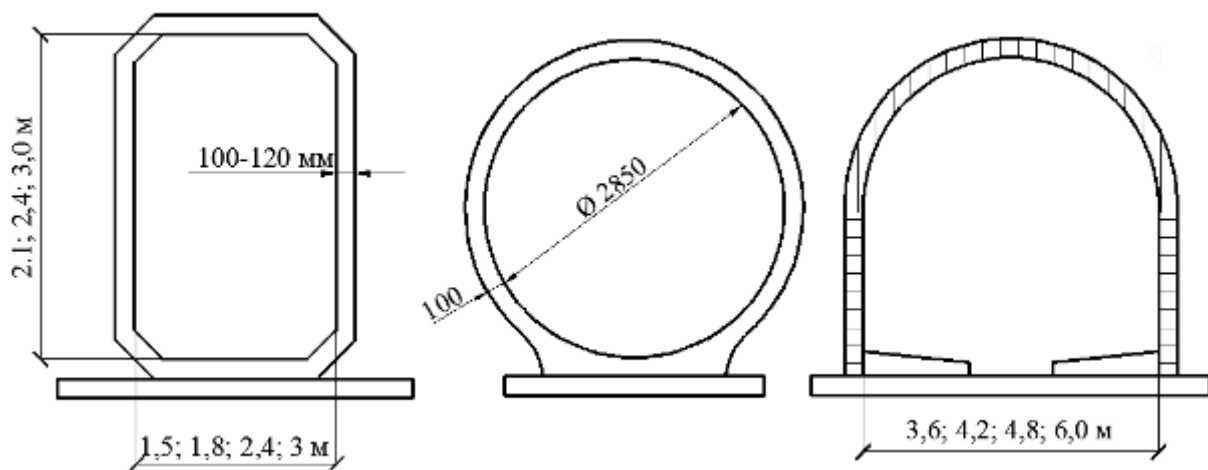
Options for tunnels made of volumetric blocks and masonry:
